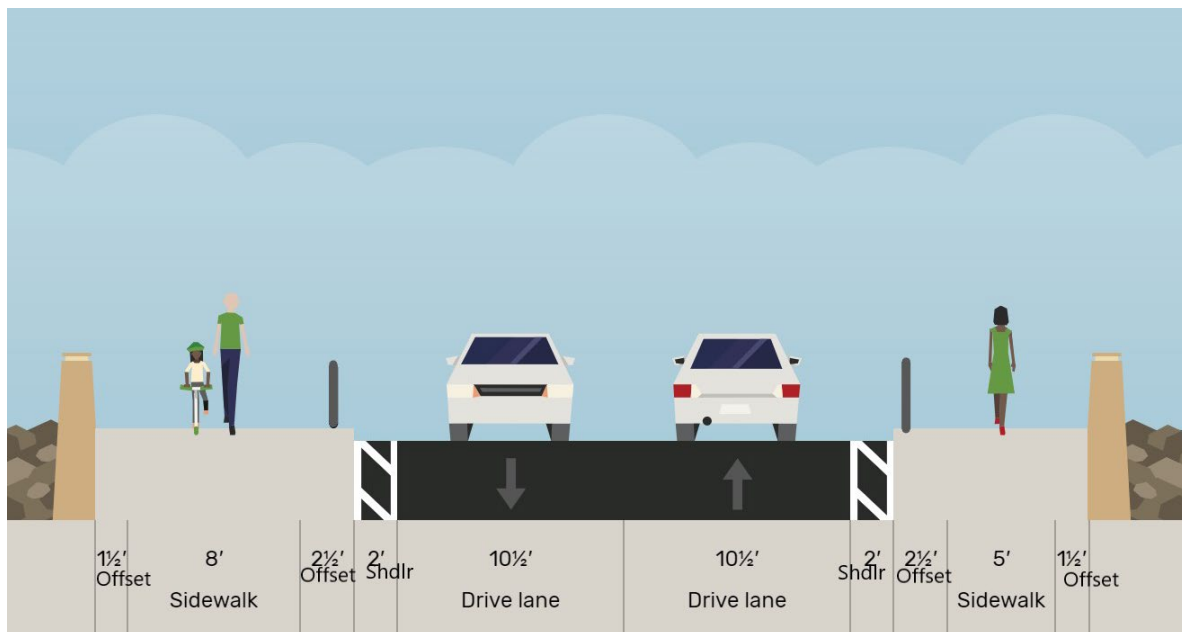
Recommended Bridge Cross Section with Master Plan Vision
